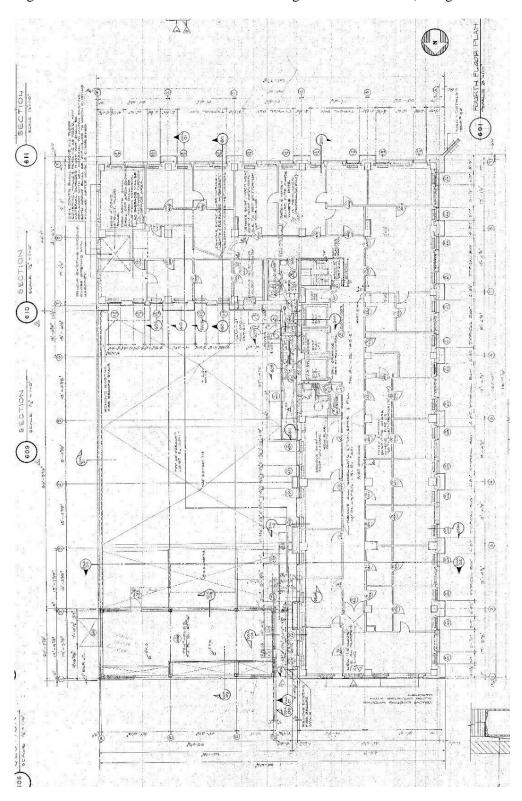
First Wichita National Bank Building Fifth Floor Plan (George Dahl Architects 1960).
